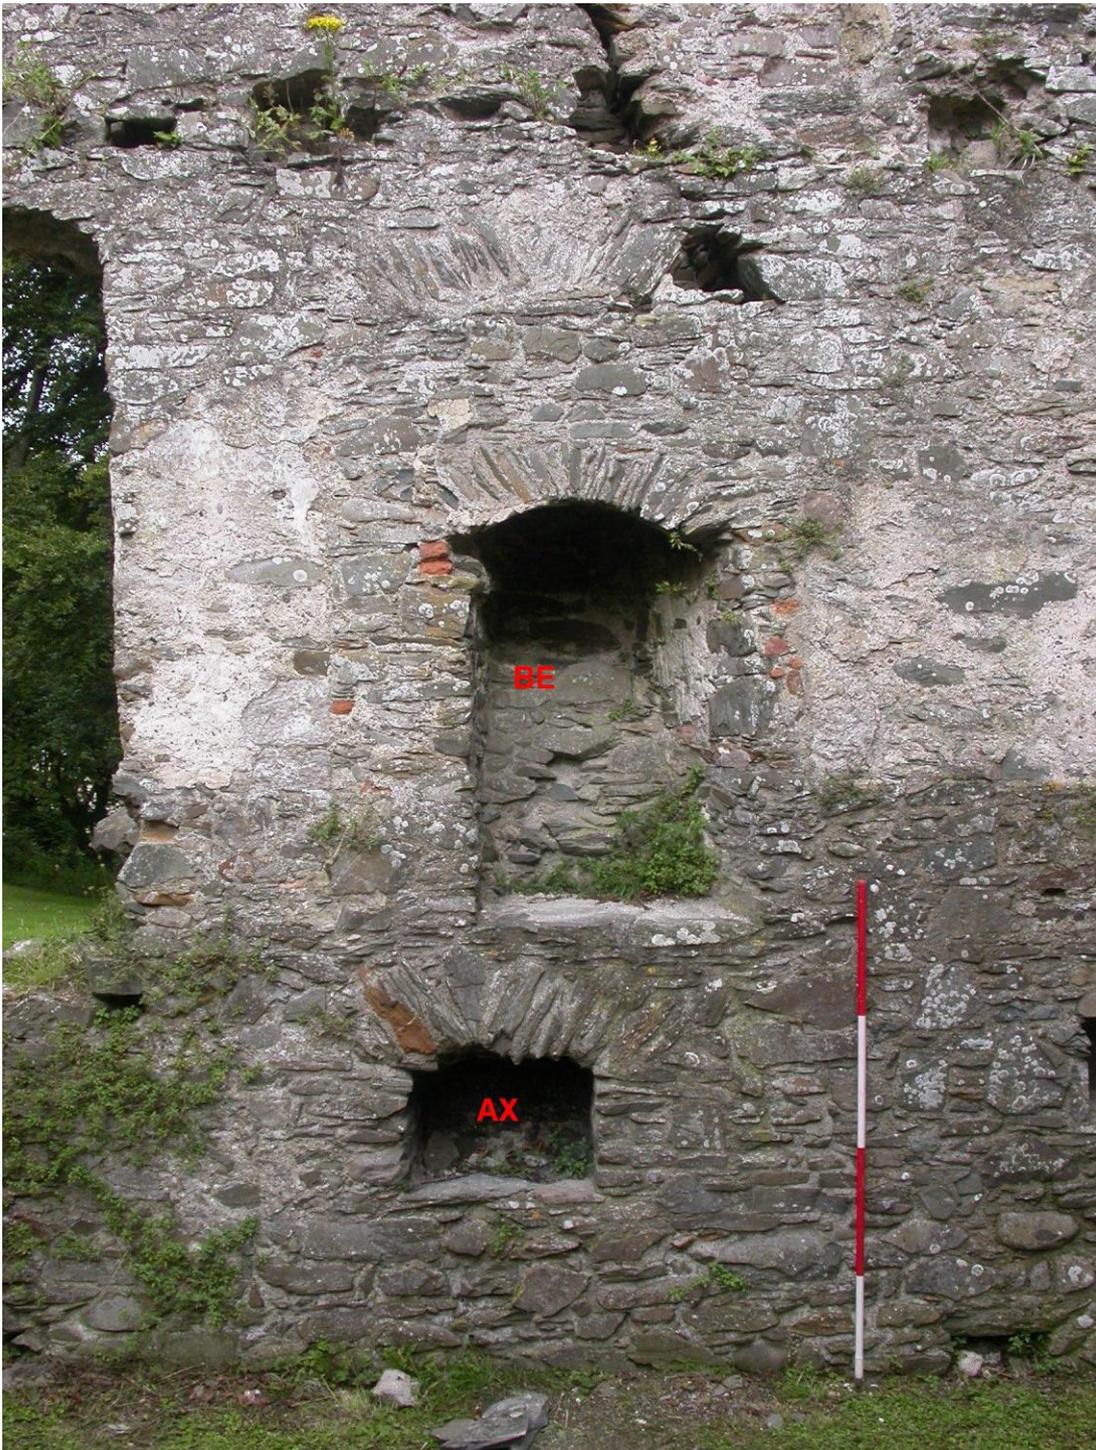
Part of the eastern wall of the east wing, showing internally-blocked fireplace (AX), ground-floor fireplace (BE), looking east. Also visible in the top of the photograph are the supporting holes for the crossbeams that carried the attic floor.
